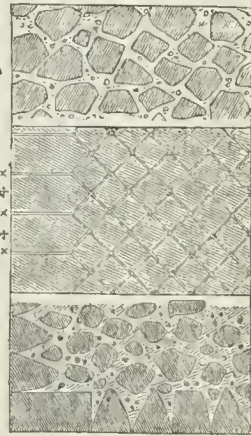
Concrete wall faced with (A) opus incertum and (B) opus reticulatum. C shows the section, similar in both.
